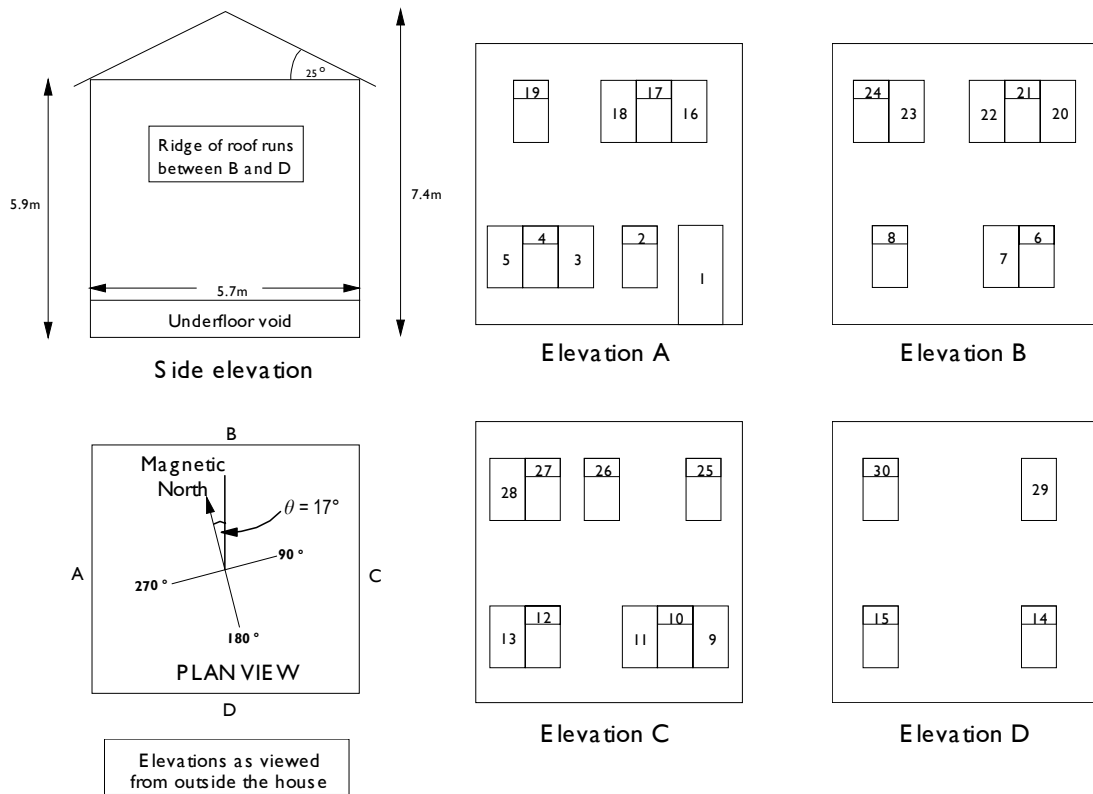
Elevations of House and Numbering System for Openable Window Vents
